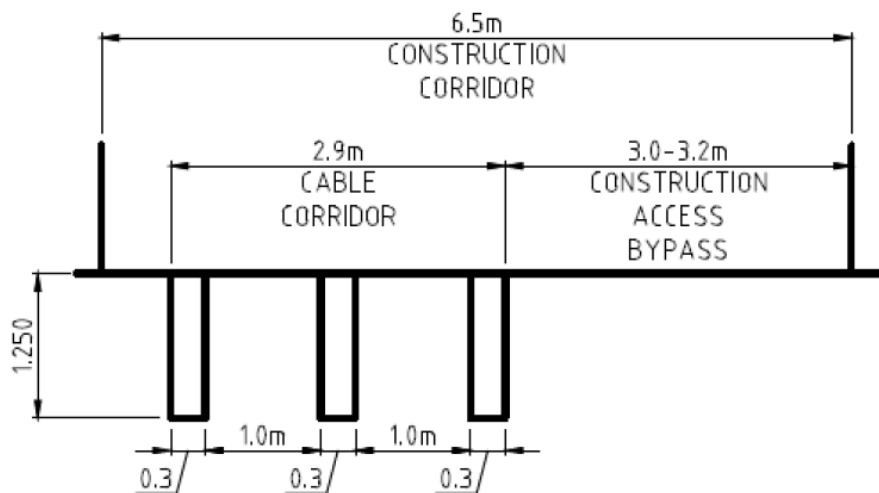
Indicative design of the underground section of the transmission line, comprising three trenches underneath an existing road with space for construction and emergency vehicles to pass alongside the trenches
